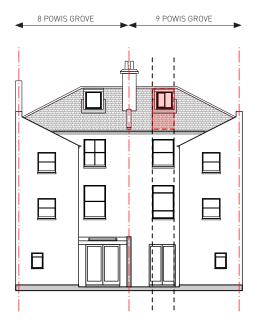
Existing Elevation Illustrating the Retained Window Pattern.
